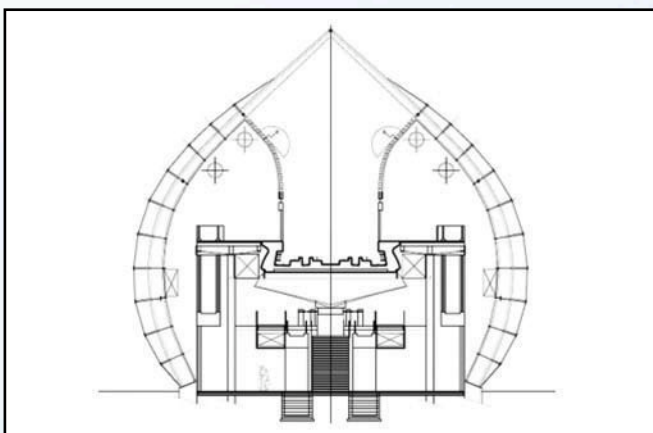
Type 1 elevated (E1) station: at-grade concourse
